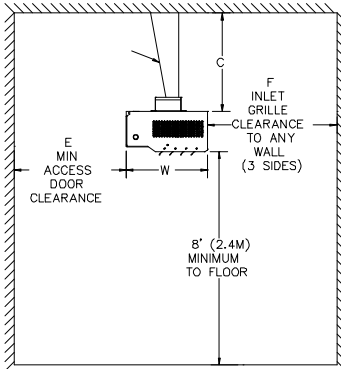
Vertical Ceiling Mount with Mounting Arm
